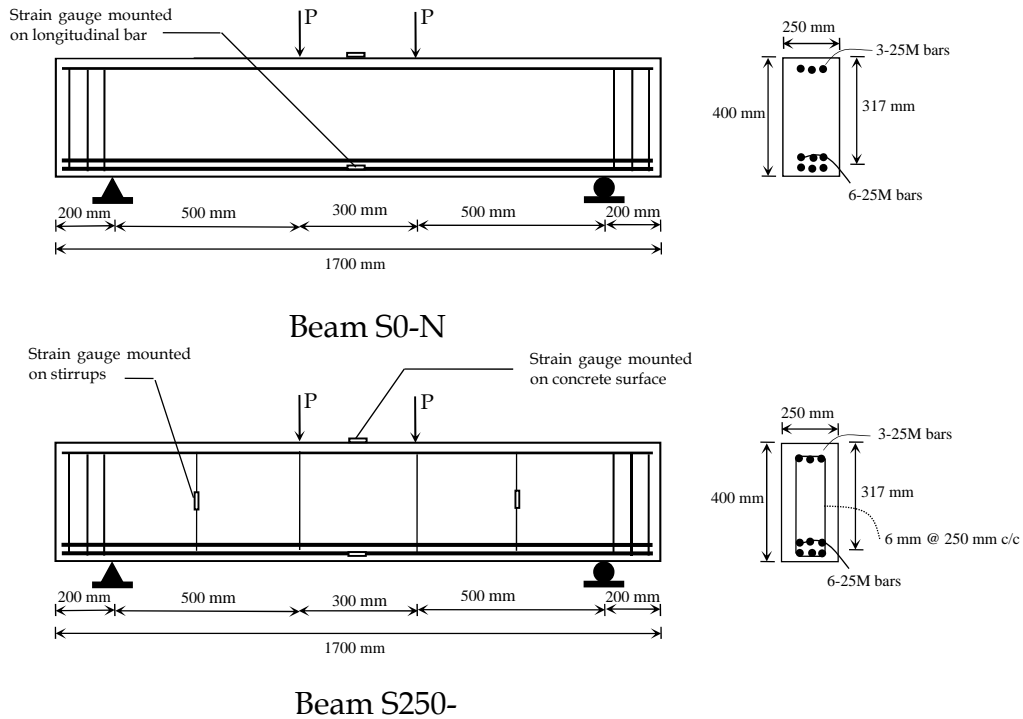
Beam geometry, reinforcement details and layout of strain gauges
